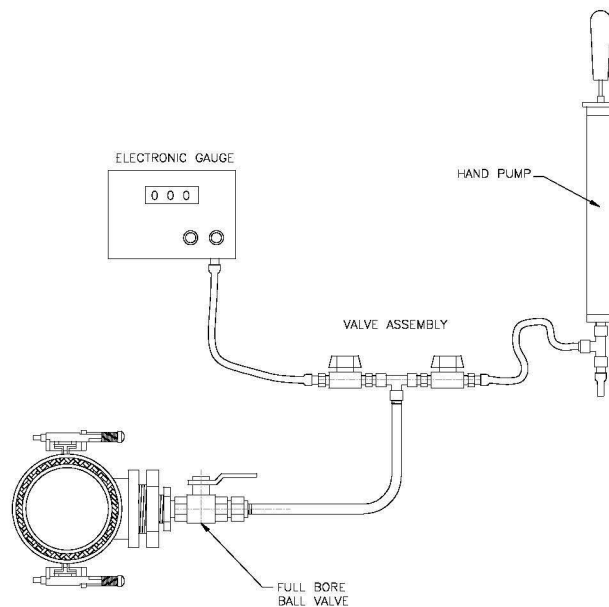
Encirclement Fitting & Valve with Test Equipment
